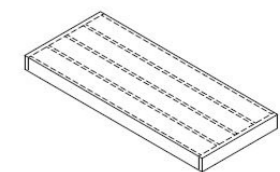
Kaufmann, Krötsch, and Winter (2018) Box floor
